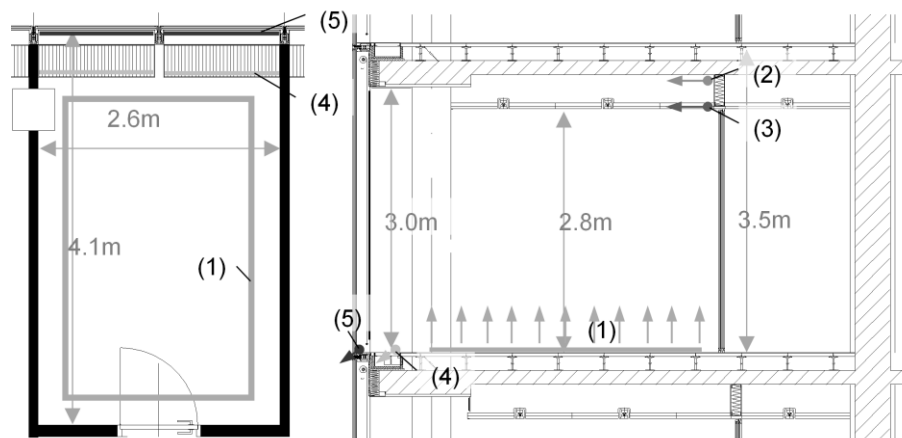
Floor plan (left side) / section (right side); location of tracer gas injection is highlighted; floor plan: direct injection to the room (1); concrete ceiling (2) cooling ceiling (3); supply air area (4); façade area (5)
